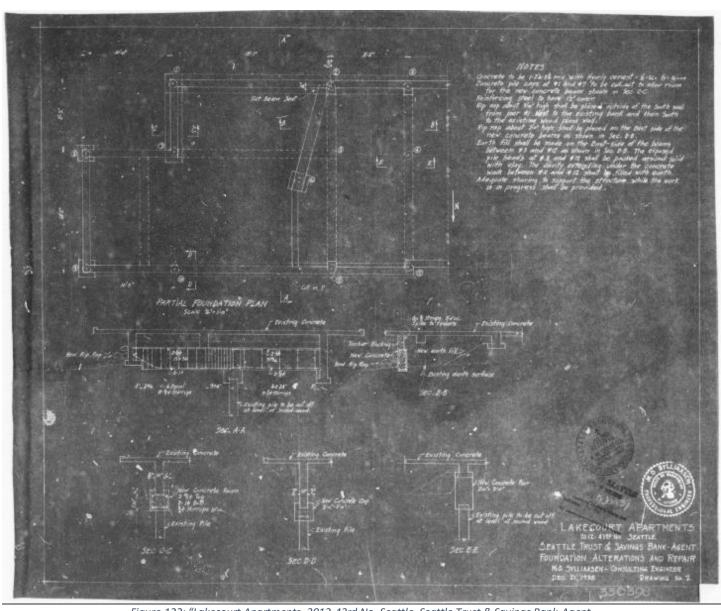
"Lakecourt Apartments. 2012-43rd No. Seattle. Seattle Trust & Savings Bank-Agent. Foundation Alterations and Repair. M.O. Sylliaasen – Consulting Engineer. Dec. 21, 1938. Drawing No. 2. [Building Permit] 330398"
